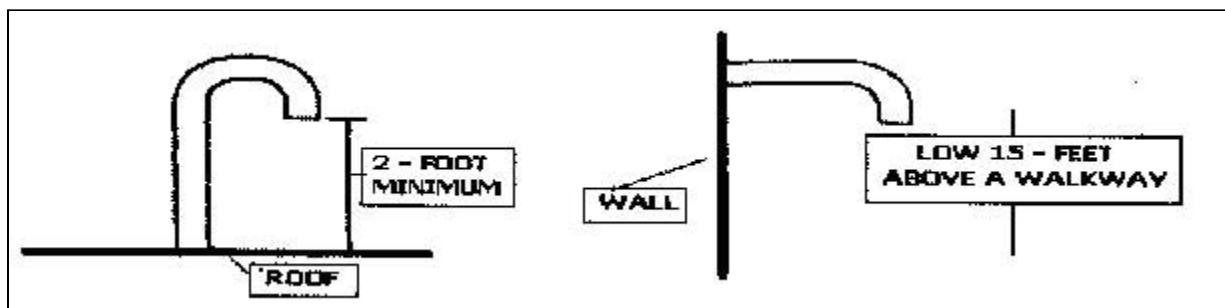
TYPICAL VACUUM FIXTURE INSTALLATION
